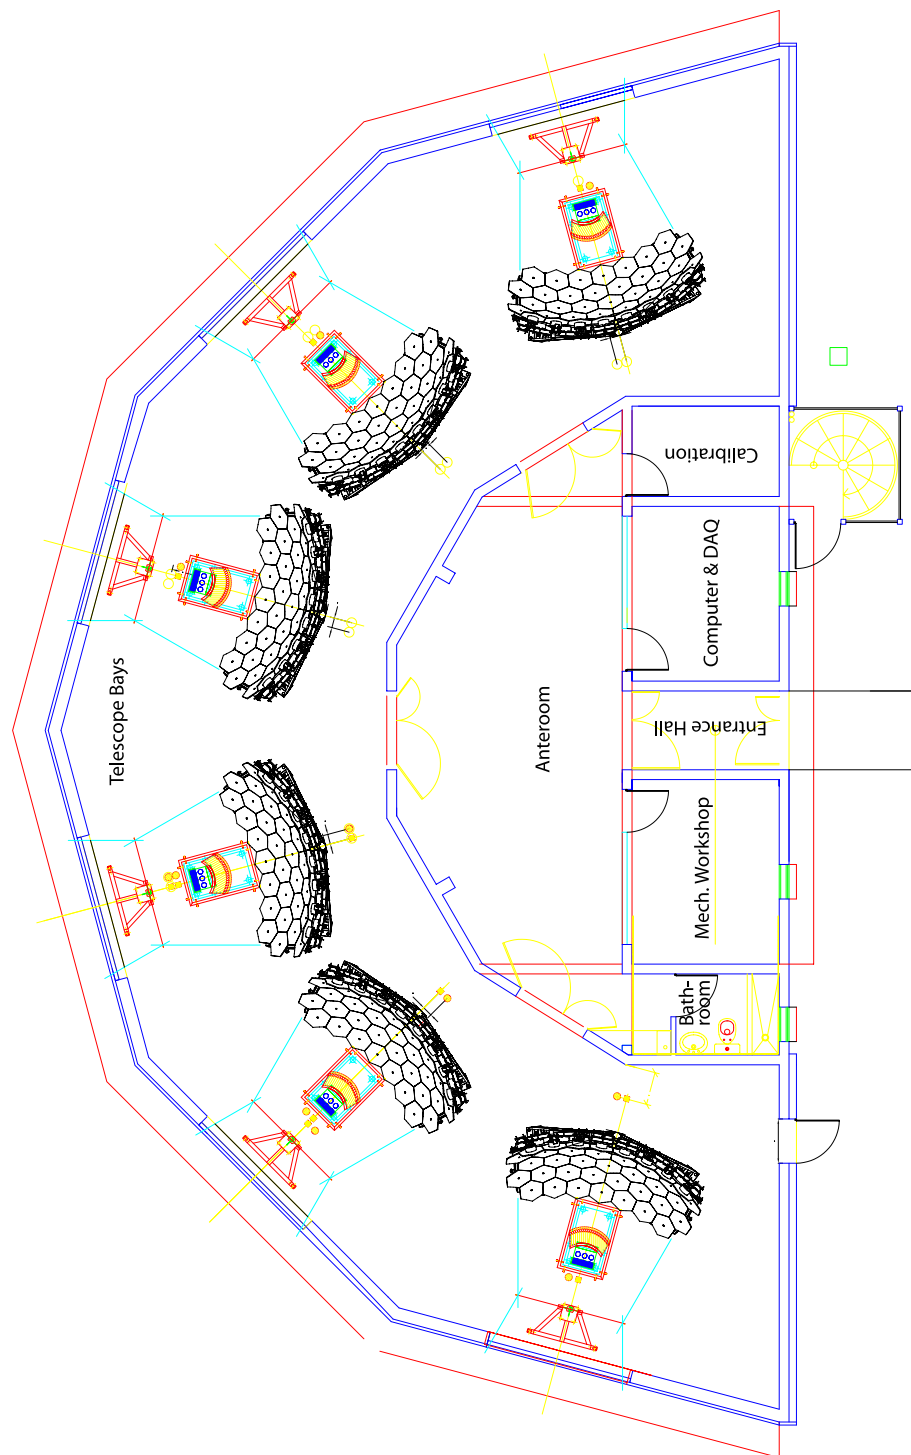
A schematic layout of an FD building housing six telescopes. From [55].
